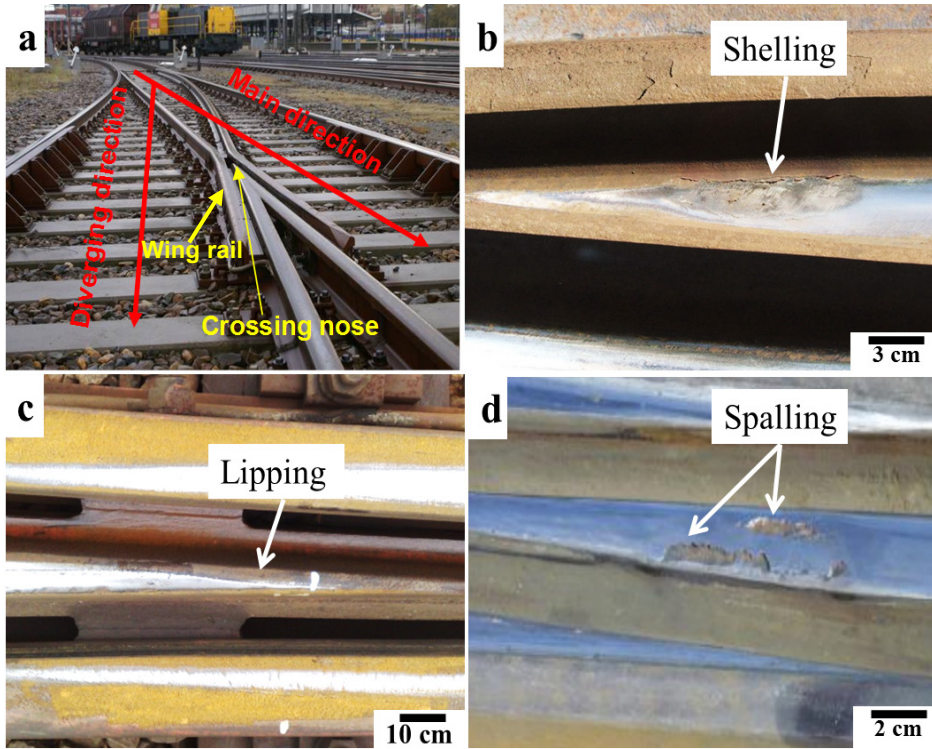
(a) Image of railway crossing, (b-d) Common defects in railway crossing nose such as (b) shelling, (c) lipping and (d) spalling.
